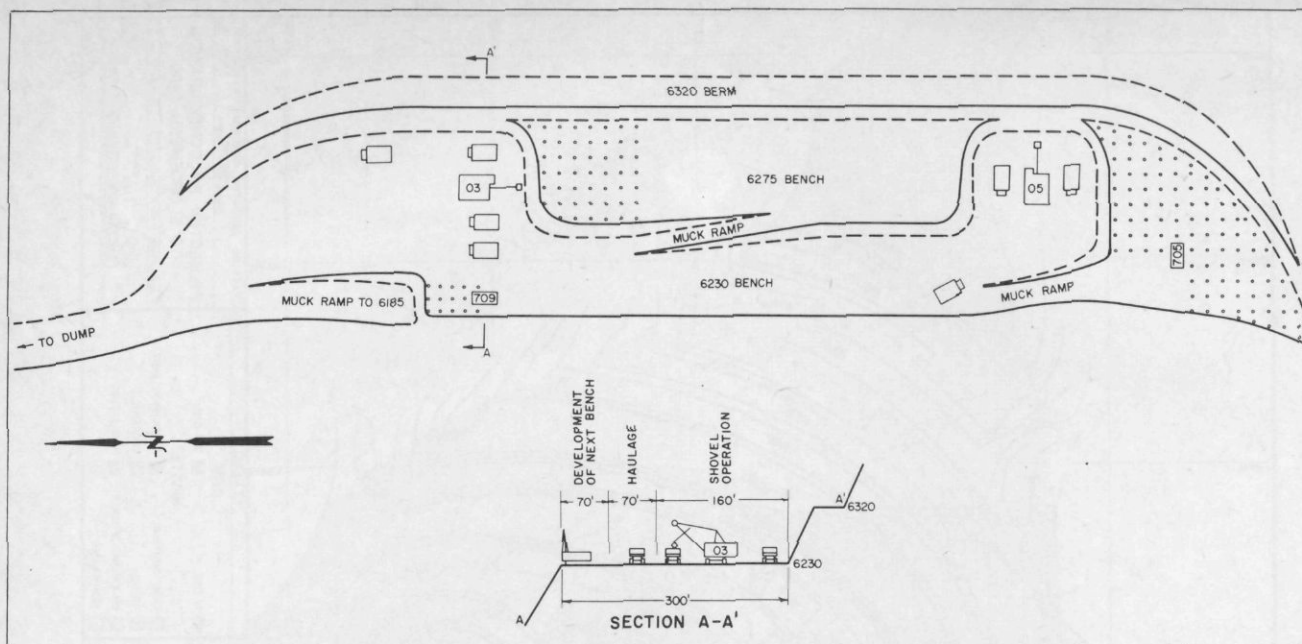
Minimum bench width for efficient operation of current waste stripping equipment.
